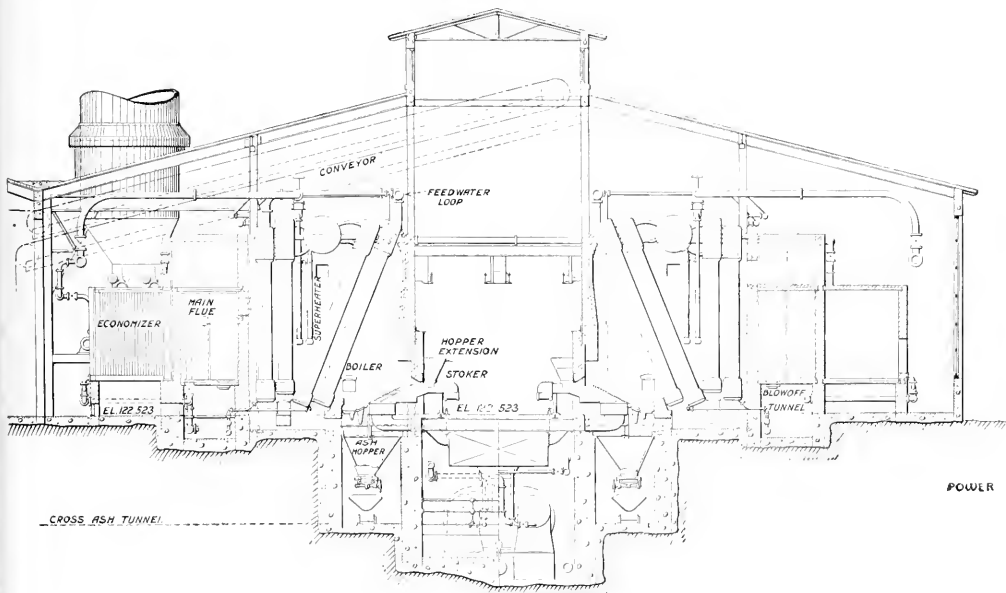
END ELEVATION OF THE NEW BOILER ROOM
